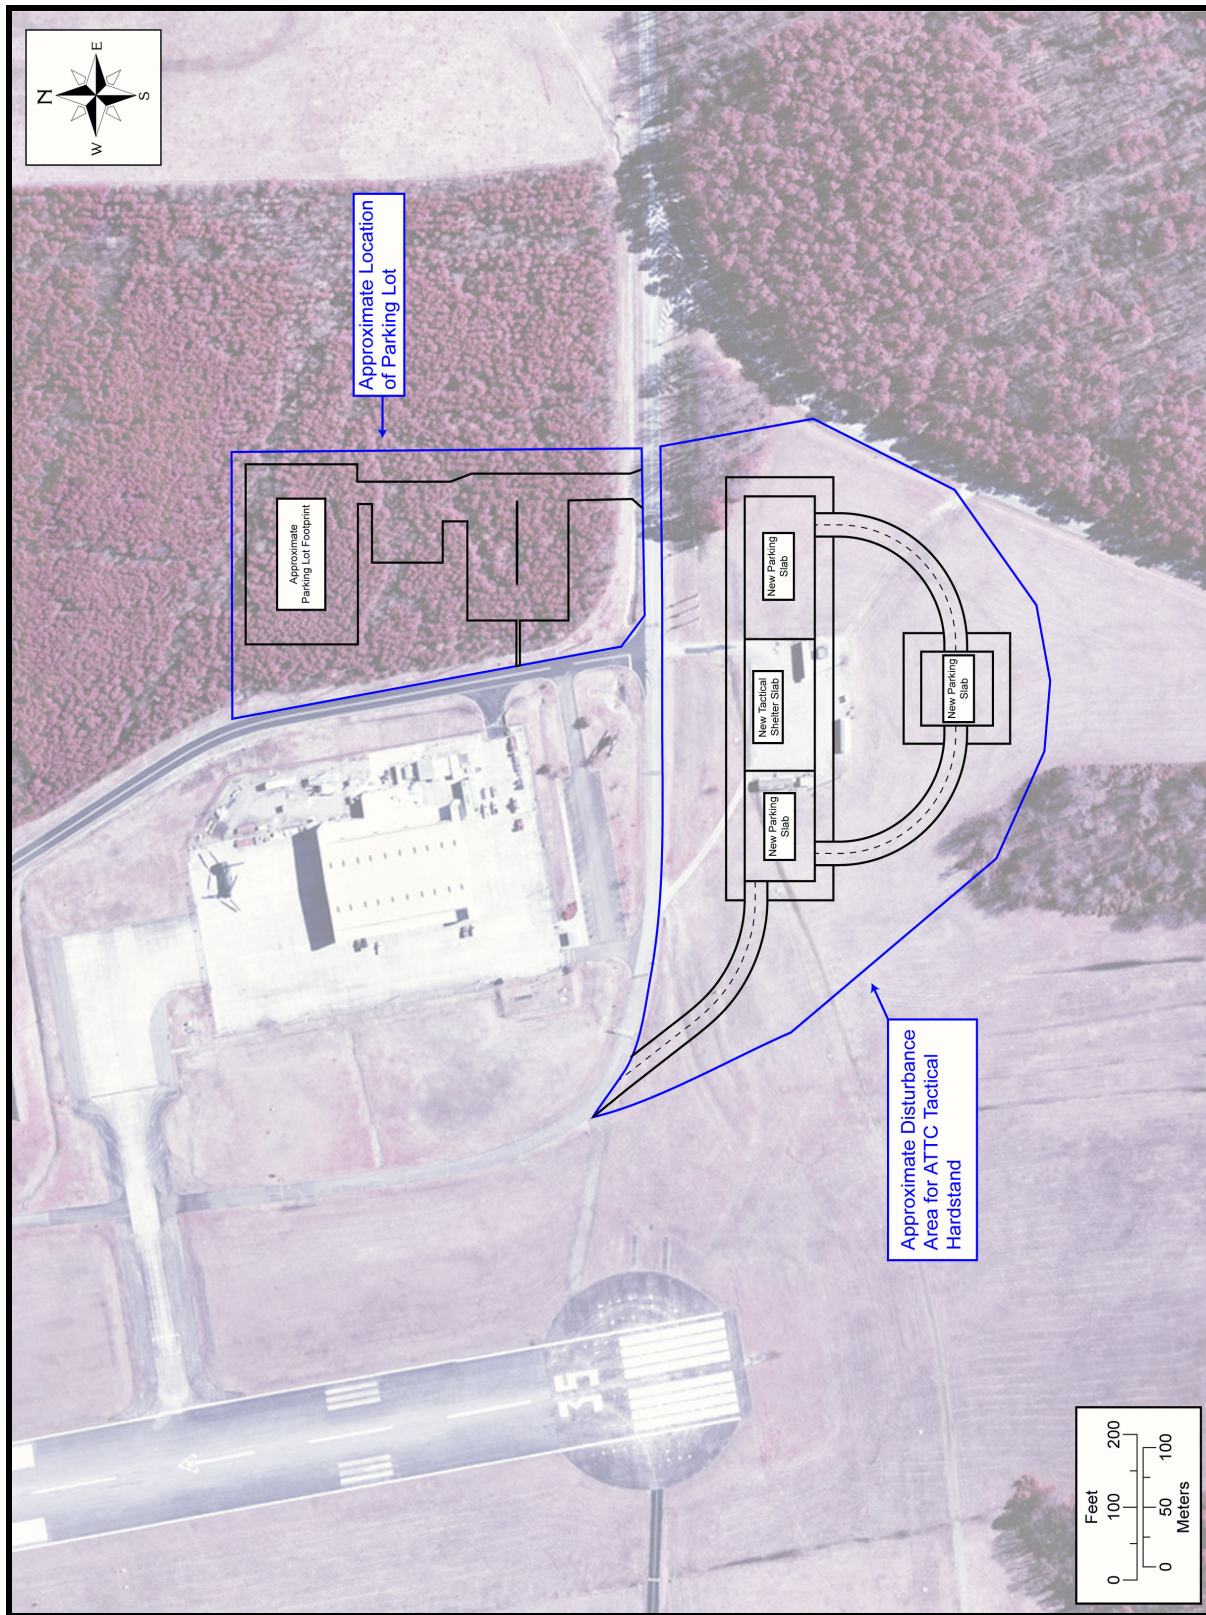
Aerial Photograph Illustrating the Proposed ATTC Tactical Hardstand and Parking Lot.
